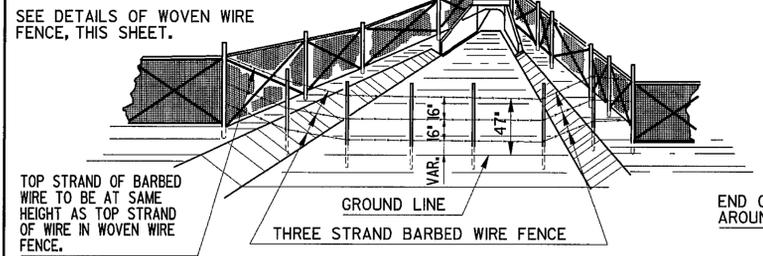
DETAIL OF FENCE BRACING WHEN APPROACHING FILL SLOPE OR ON ANGLE GREATER THAN 15 DEGREES
